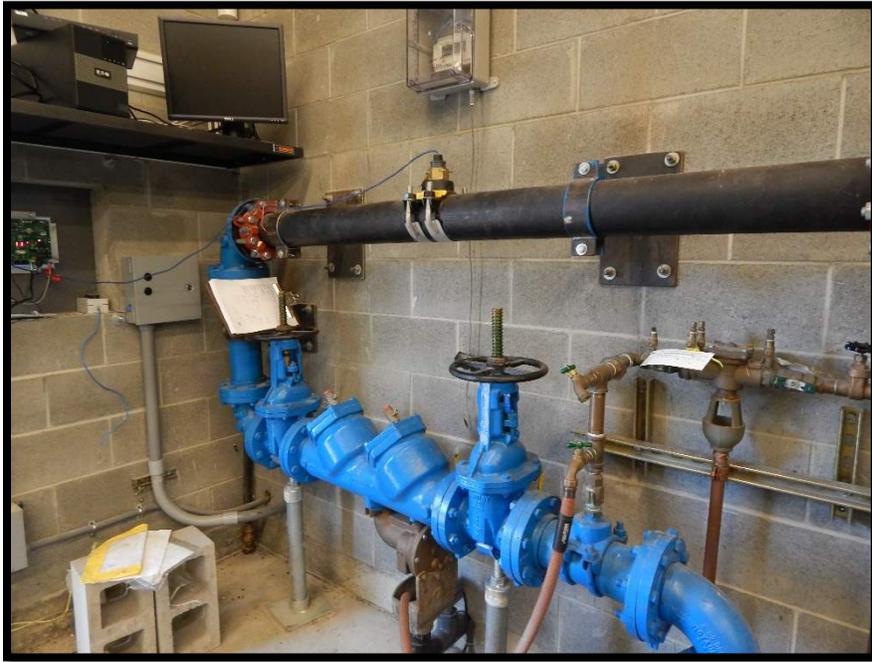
New penetration added for water filling station (Top left of Photo)
